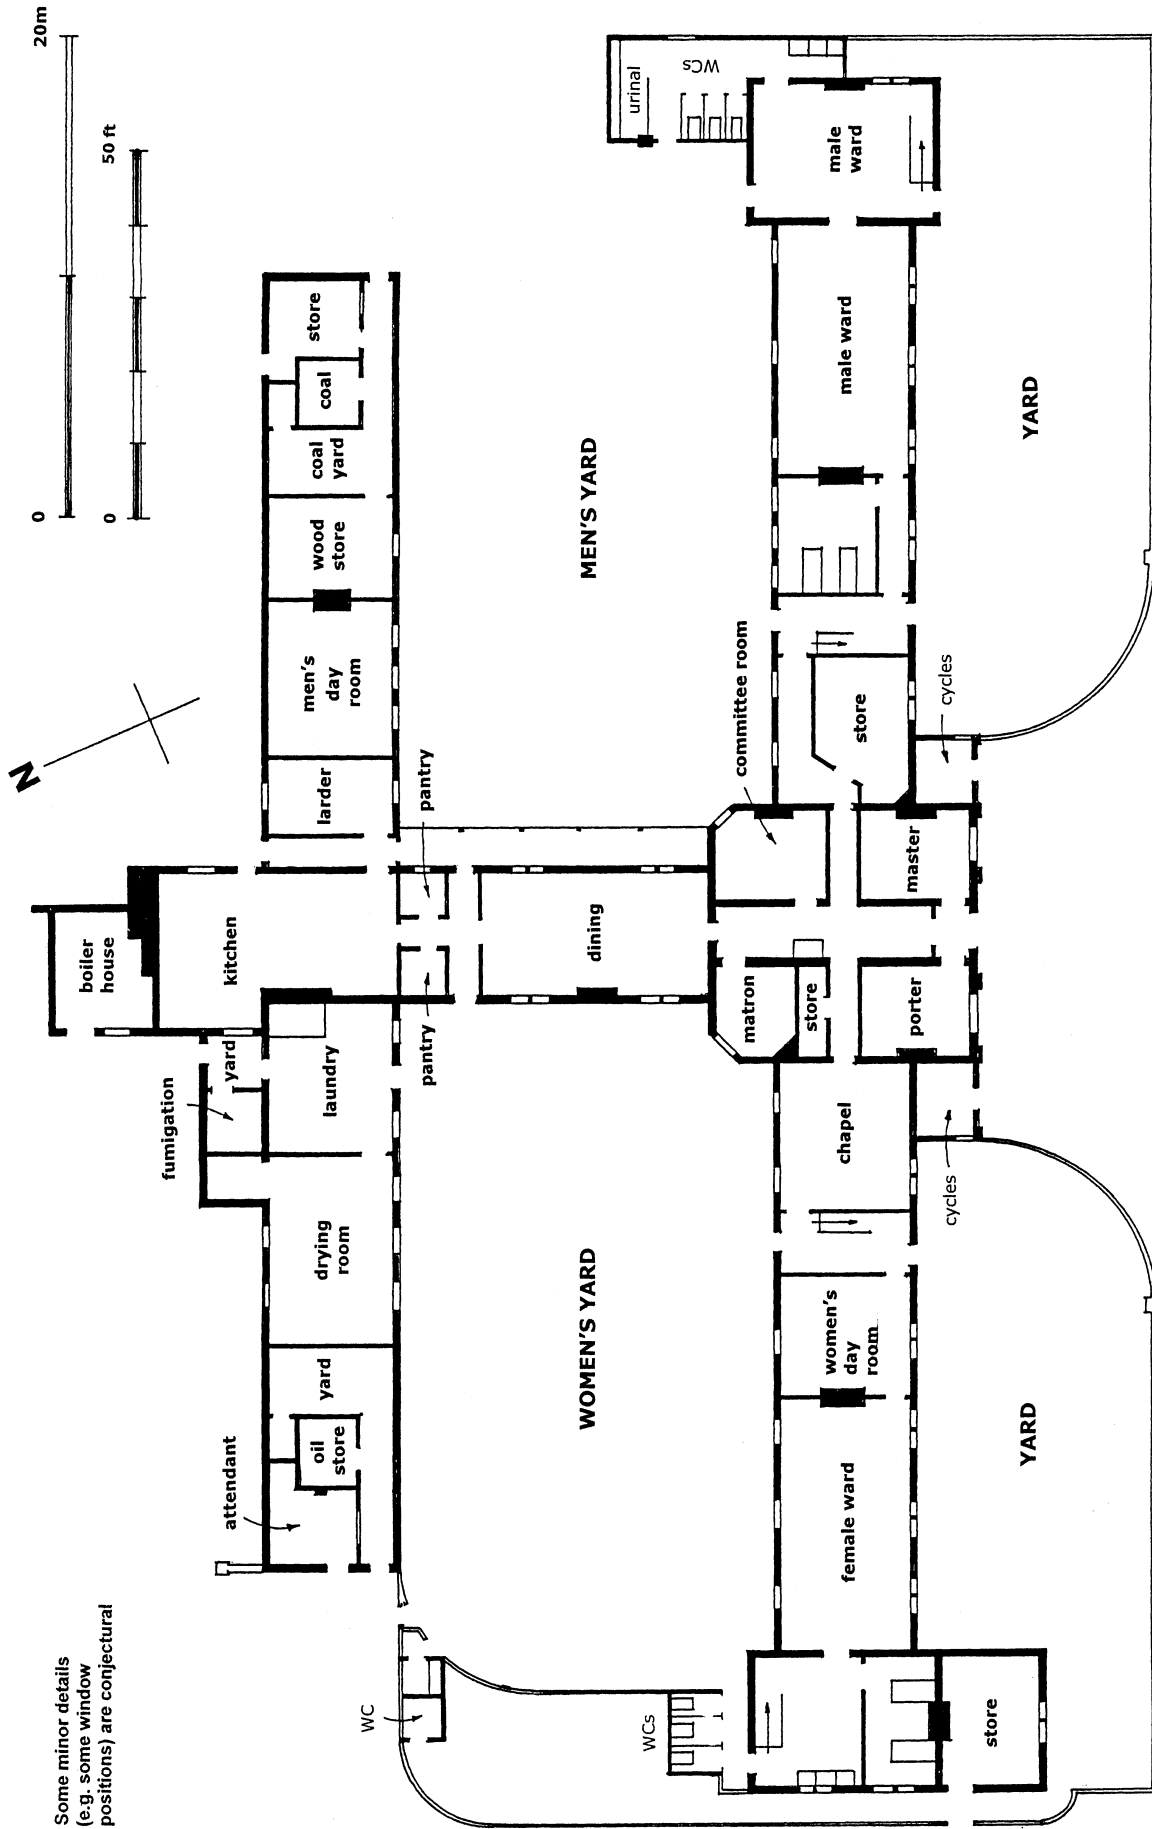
Plan of Audley House (formerly Newport Union Workhouse) shortly after the repeal of the Poor Law. (Based on a plan of c.1932.)
